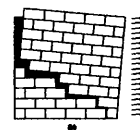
8 - Units 143,144,145,180. Construction layout and damage pattern.
